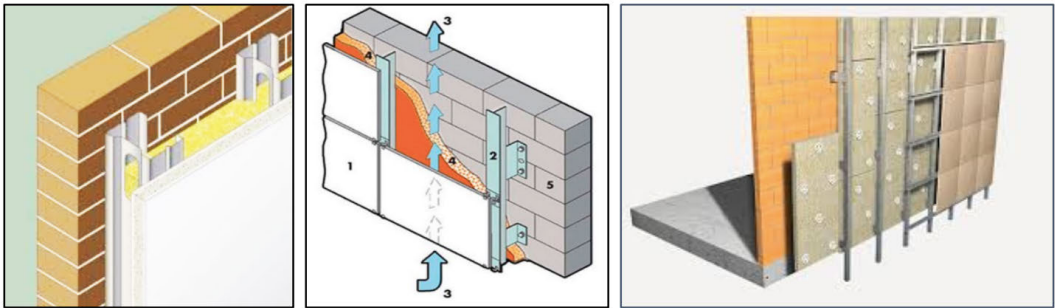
Double walls with Intervention: New 6mm fiber cement wall, fixed to a 64 and 65 mm. drywall metal structure, with interior thermal insulation of 2" mineral wool blanket + matte oil paint after applying base color and sealing of joints.
